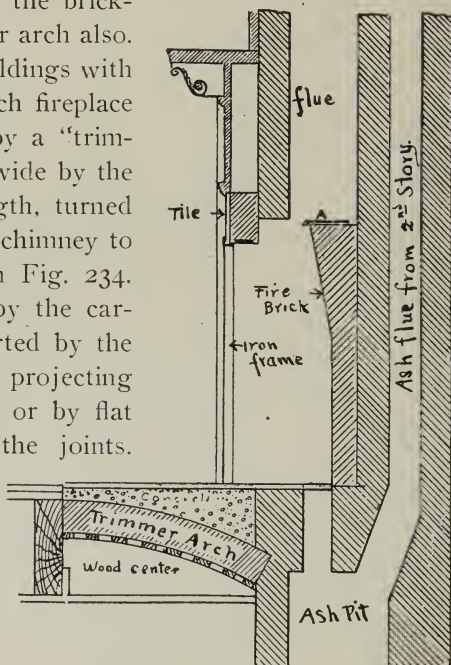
Section Through Brick Fireplace, Chimney Flues and Ash-pit.
